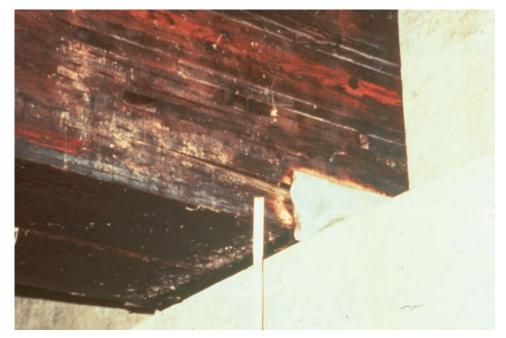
Close-up View of End of a Stress-Laminated Timber Bridge Showing Laminations
